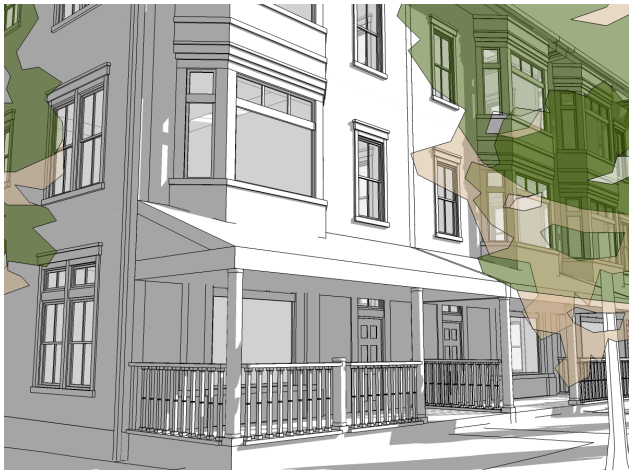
d.1 & 3. Building entrance incorporates a porch. Ground floor windows are oriented toward the street.
